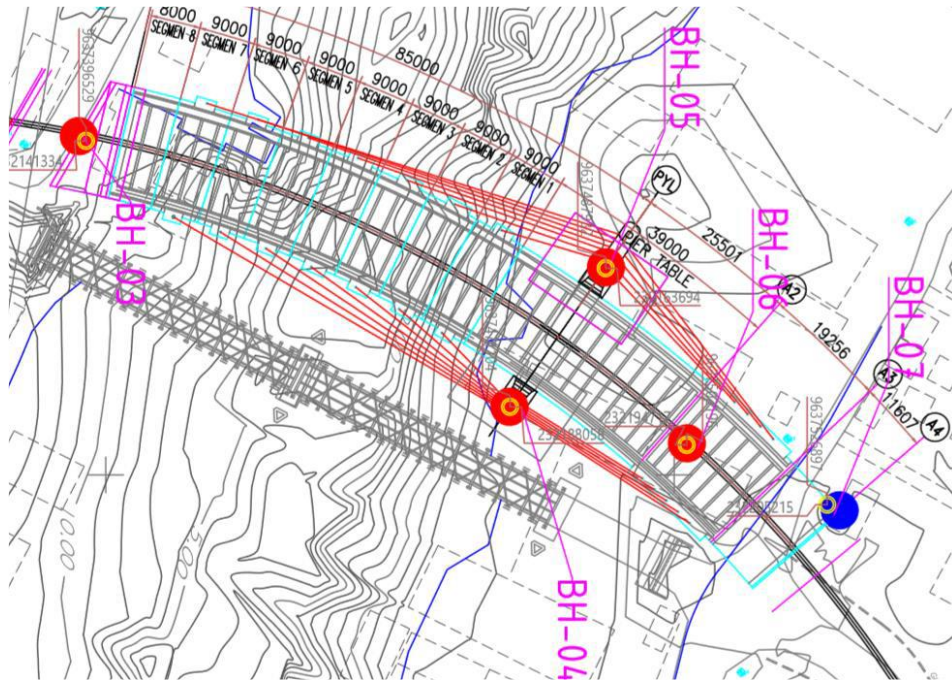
Layout of SPT test in Sei Alalak Bridge project
